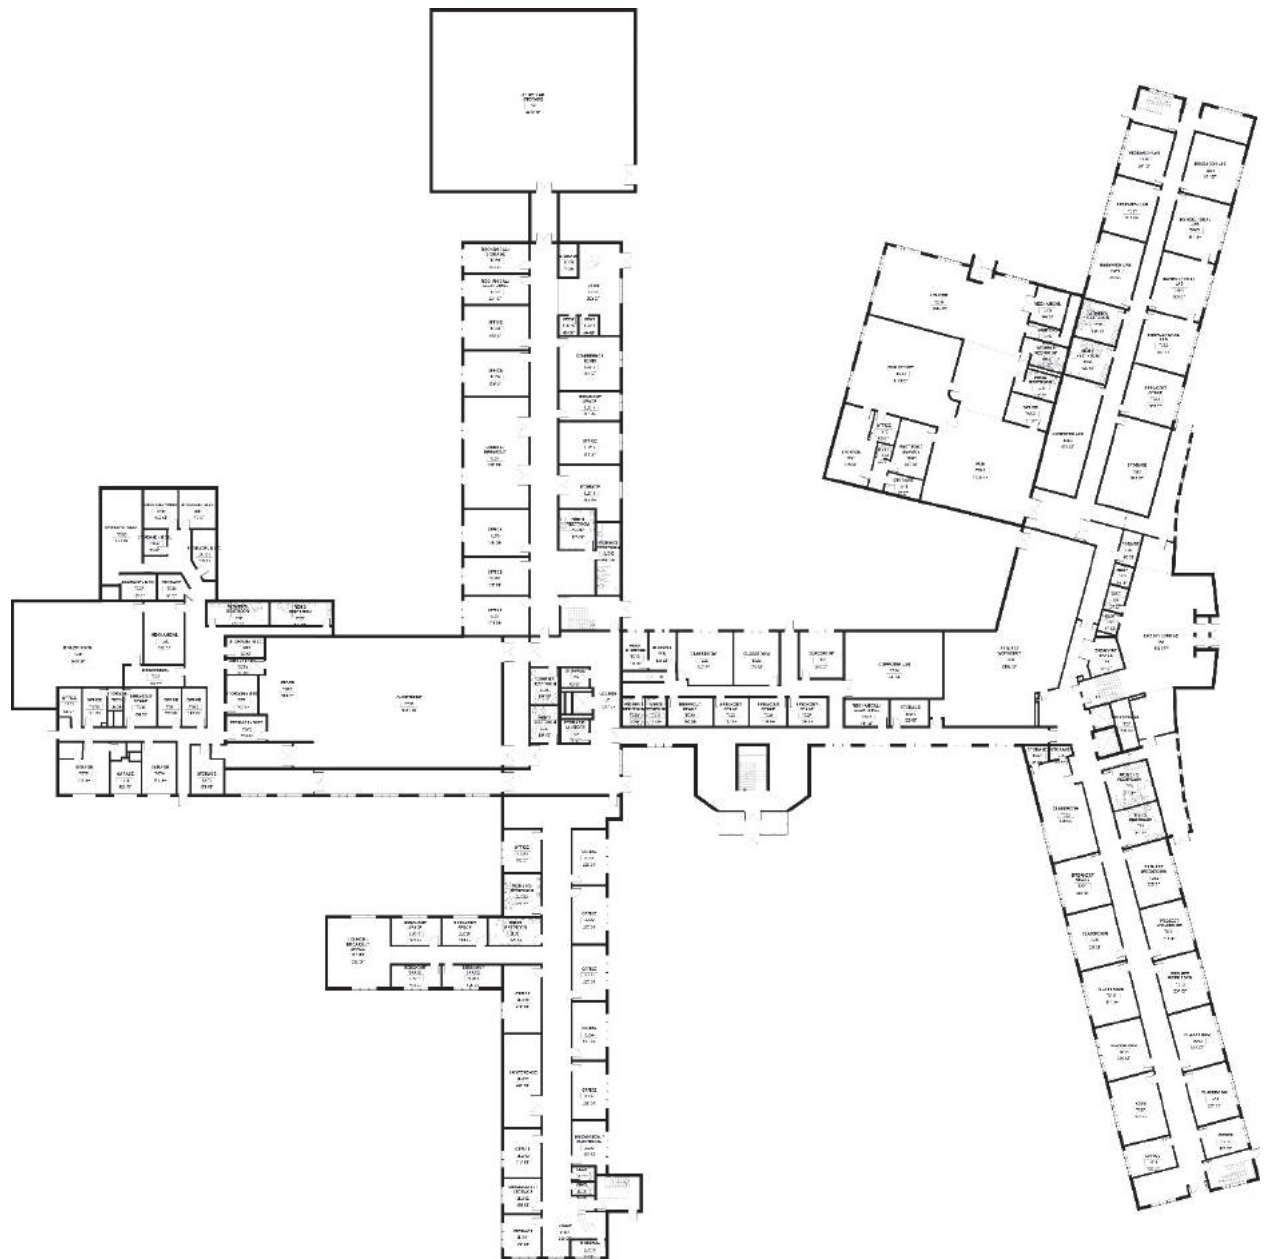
First level floor plan of overall Northeast Technical Building (right), leasable office spaces (central north and west), auditorium/existing chapel and mechanical/boiler room (left)
